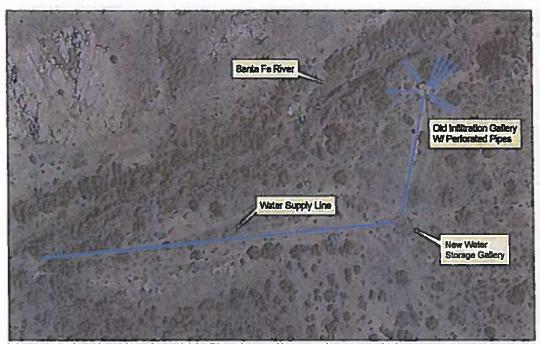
Site plan showing old infiltration gallery at river coupled to new water storage gallery and supply line. Site Plan by Arnold Valdez.
